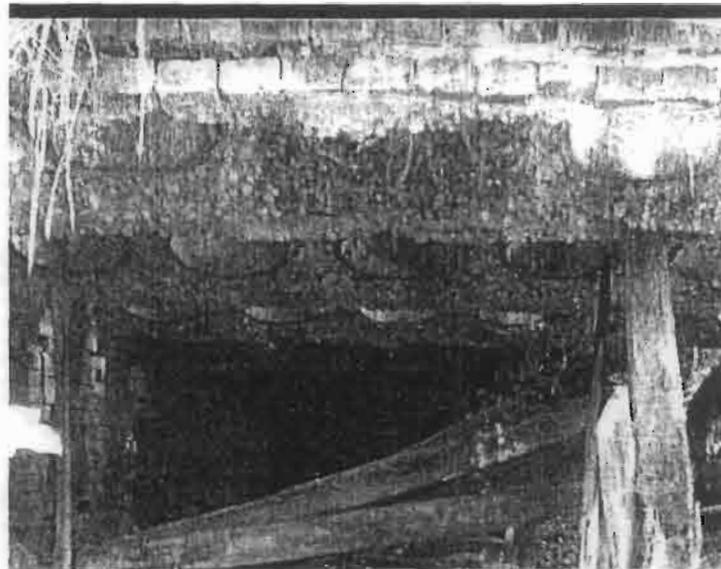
Old Ore Furnace detail showing ceramic pipes in ceiling.
